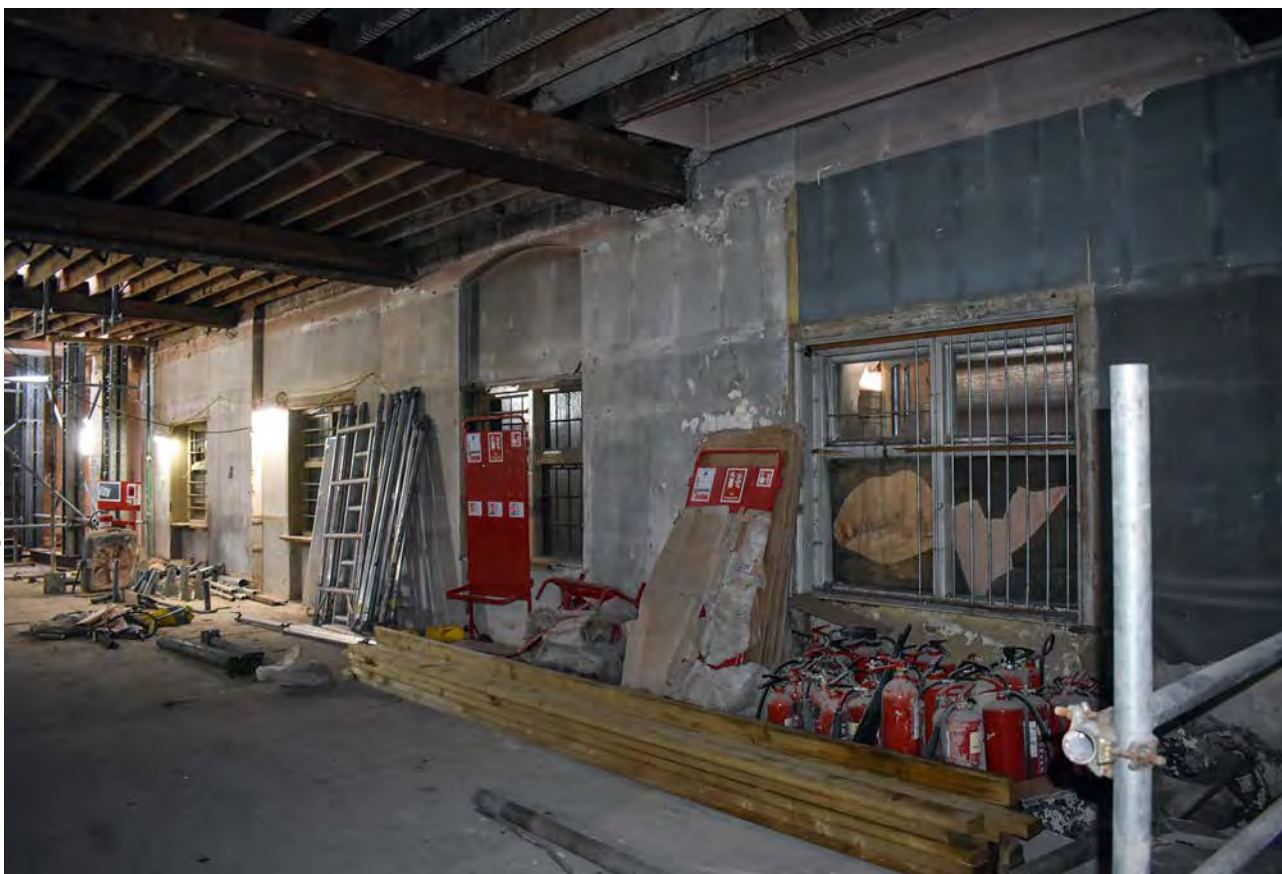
The ground floor of 31 Cornmarket Street, looking south-east
